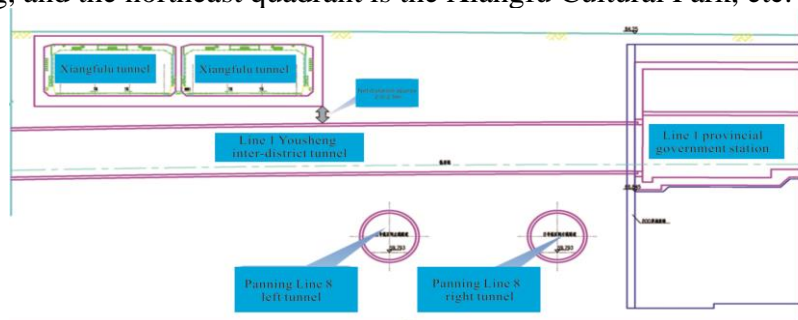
Profile diagram between Xiangfu Road tunnel and planned subway tunnel
